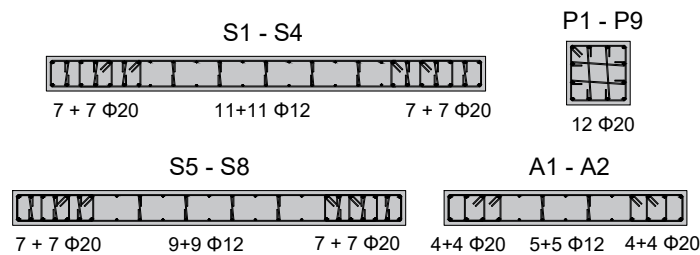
Reinforcement layouts in vertical structural elements at the ground floor.
